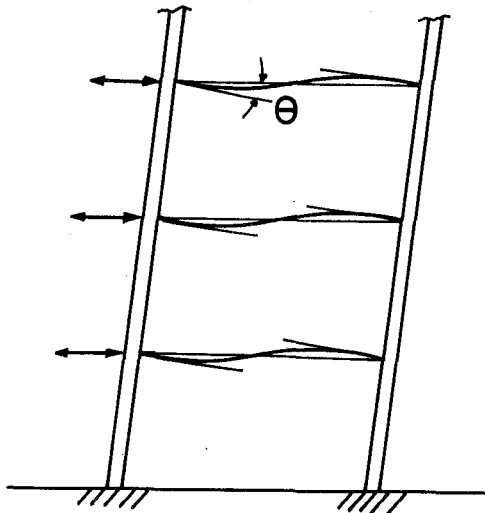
DEFORMATIONS OF BEAMS IN A TALL BUILDING
